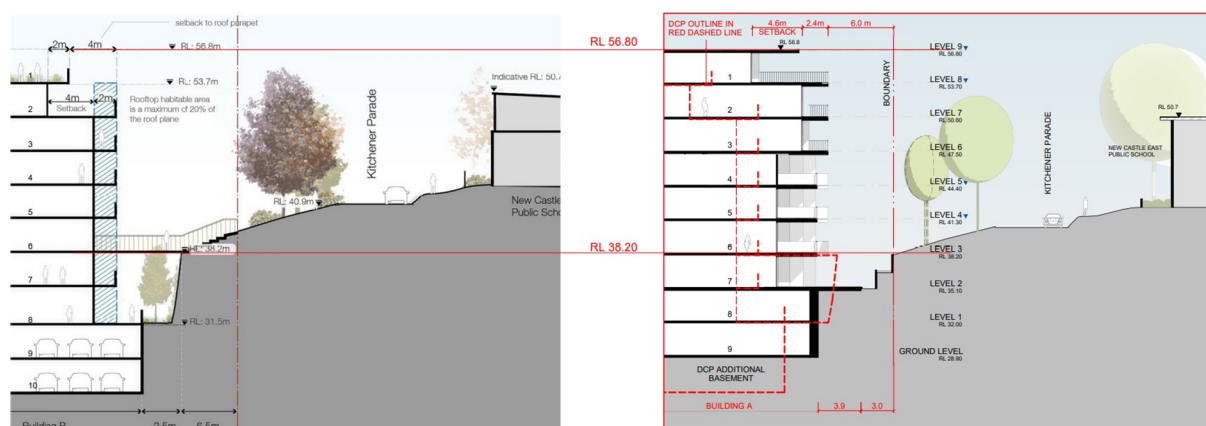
(of DCP) - Kitchen Parade upper (shown left) and proposed cross section (shown right)
